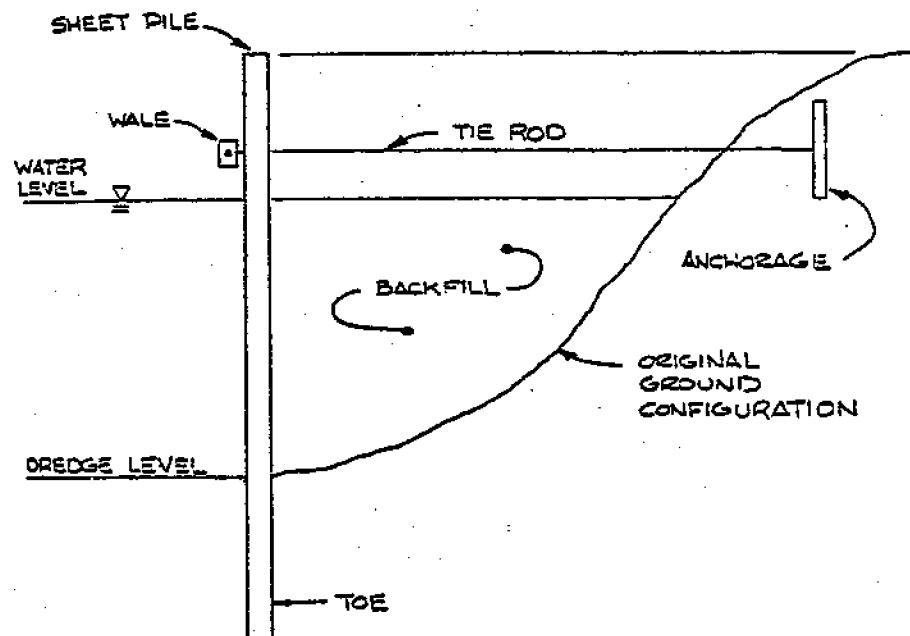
Anchored Bulkhead Wall (Saczyński and Kulhawý, 1982, p. 8)
